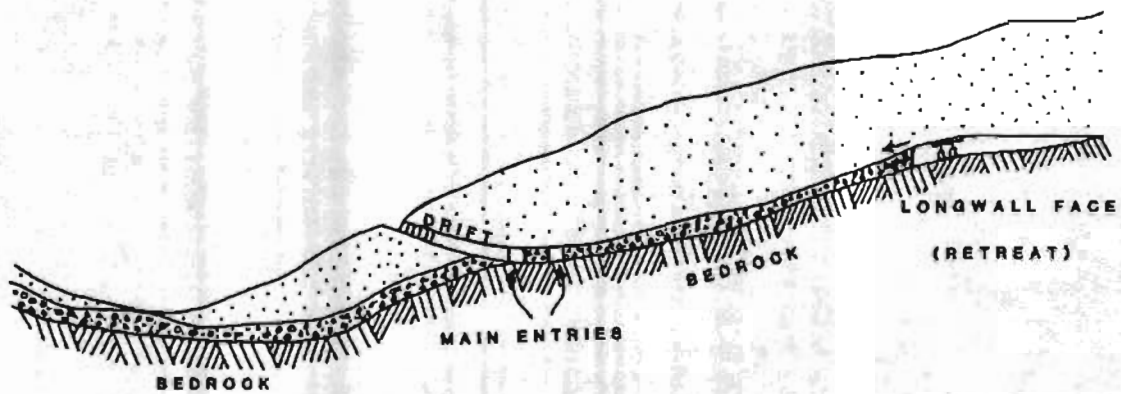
Longwall Mining in a Placer Deposit -- a cross section.
